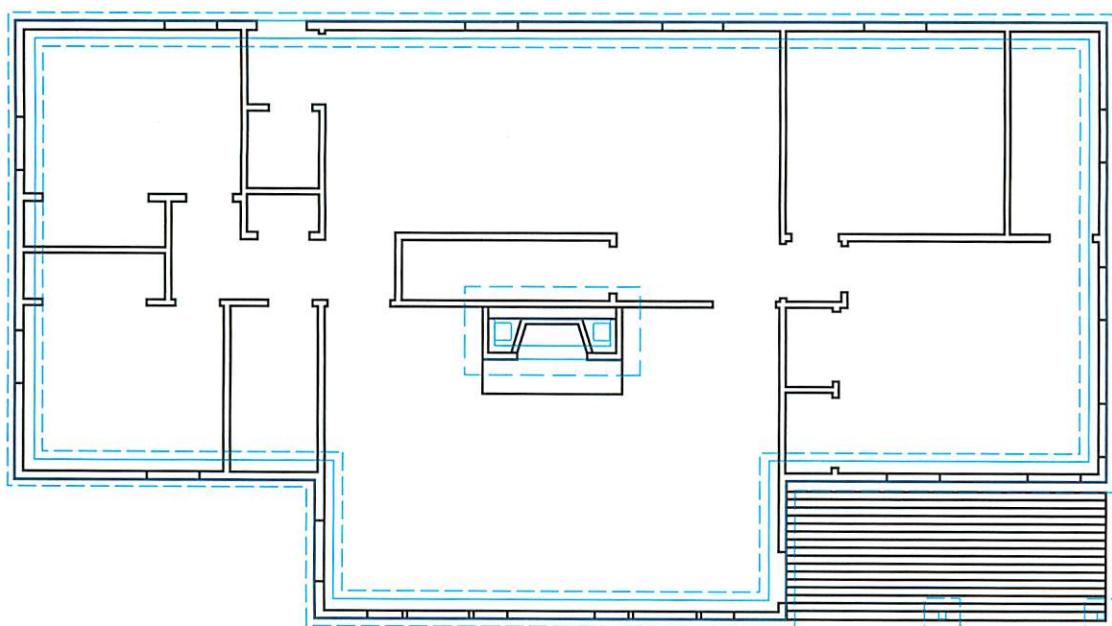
The floor plan for the first floor is copied to the foundation/basement plan layer. Footings and piers are then added. Notice how the floor plan layer is visible on top of the foundation/basement plan layer.
